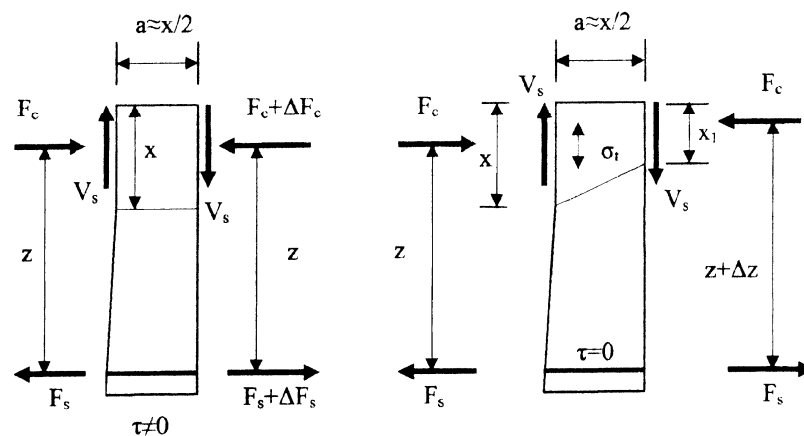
Equilibrium of cantilever teeth before and after bond failure
